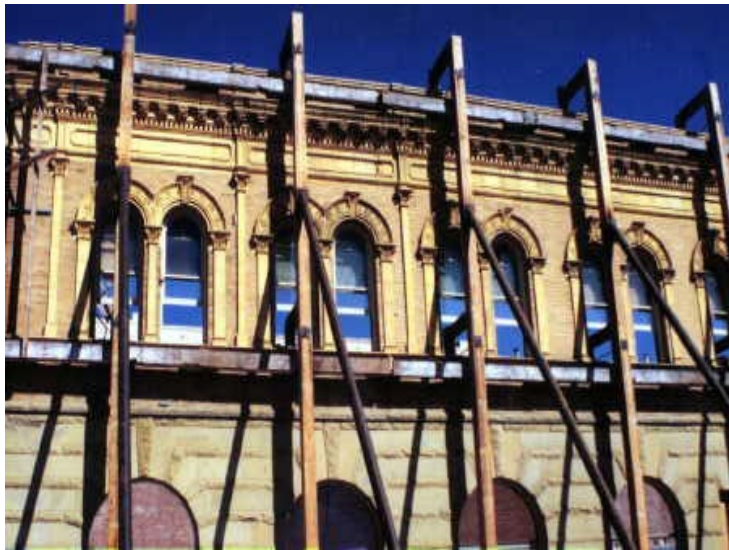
Historic building's façade was preserved by steel girding and shoring. Then the earthquake damaged interior was demolished and removed. A new interior structure and roof was built and attached to the façade. The building is now in use. This building was damaged in downtown Santa Cruz in the 1989 Loma Prieta Earthquake.
